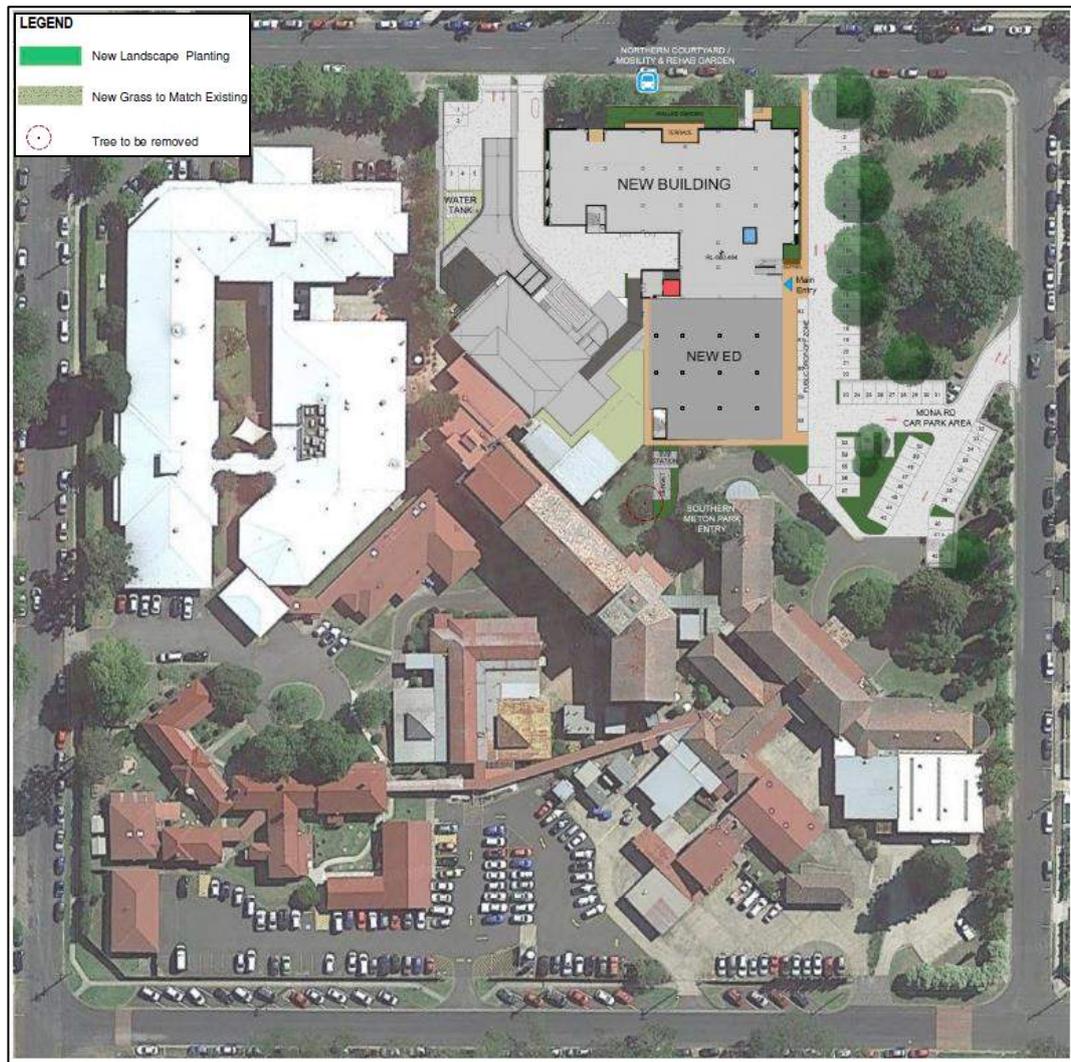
Site Plan showing scope of proposed works (Source: MSJ)
